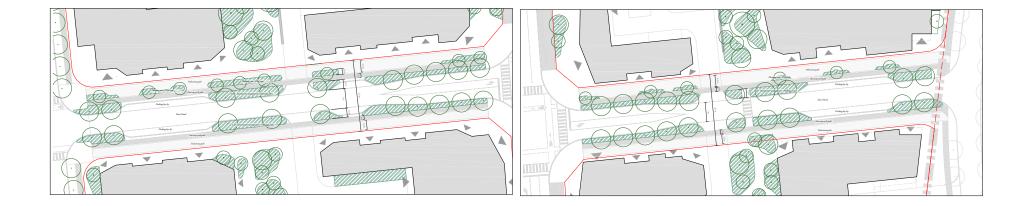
Davis Road Streetscape Plan prepared by SLA
